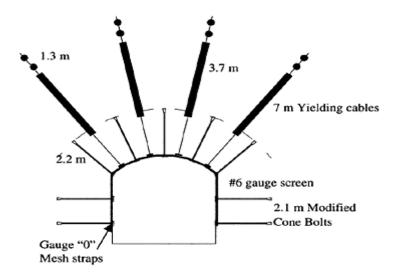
The Rockburst Support System with 7 m debonded cables for large intersections and future stope backs.
